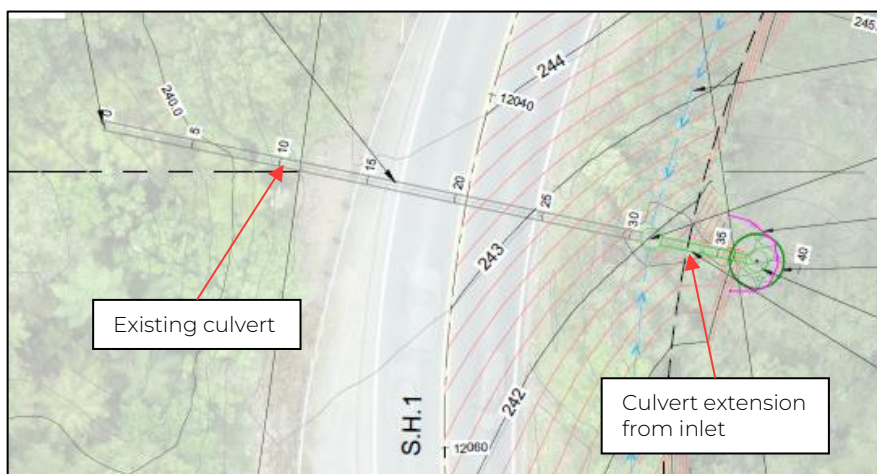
Site B2 existing culvert shown in grey and new extension and scruffy dome manhole in green.
